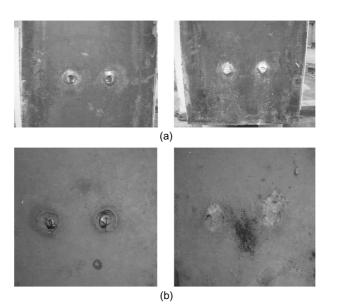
Fatigue failure modes of specimen (ST-F-A1): (a) Steel, (b) Concrete slab
